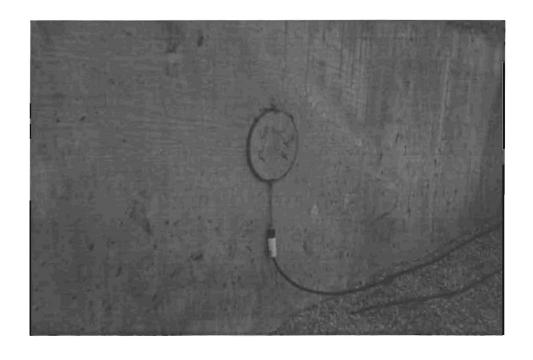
An Installed Earth Pressure Cell on Abutment Wall
